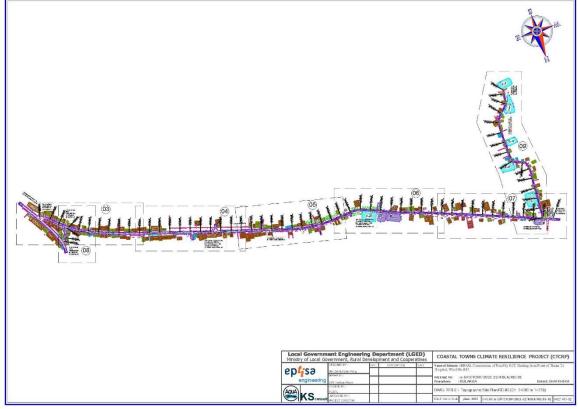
Typical Cross section and Topographic Site Plan of the Proposed Road Subproject
